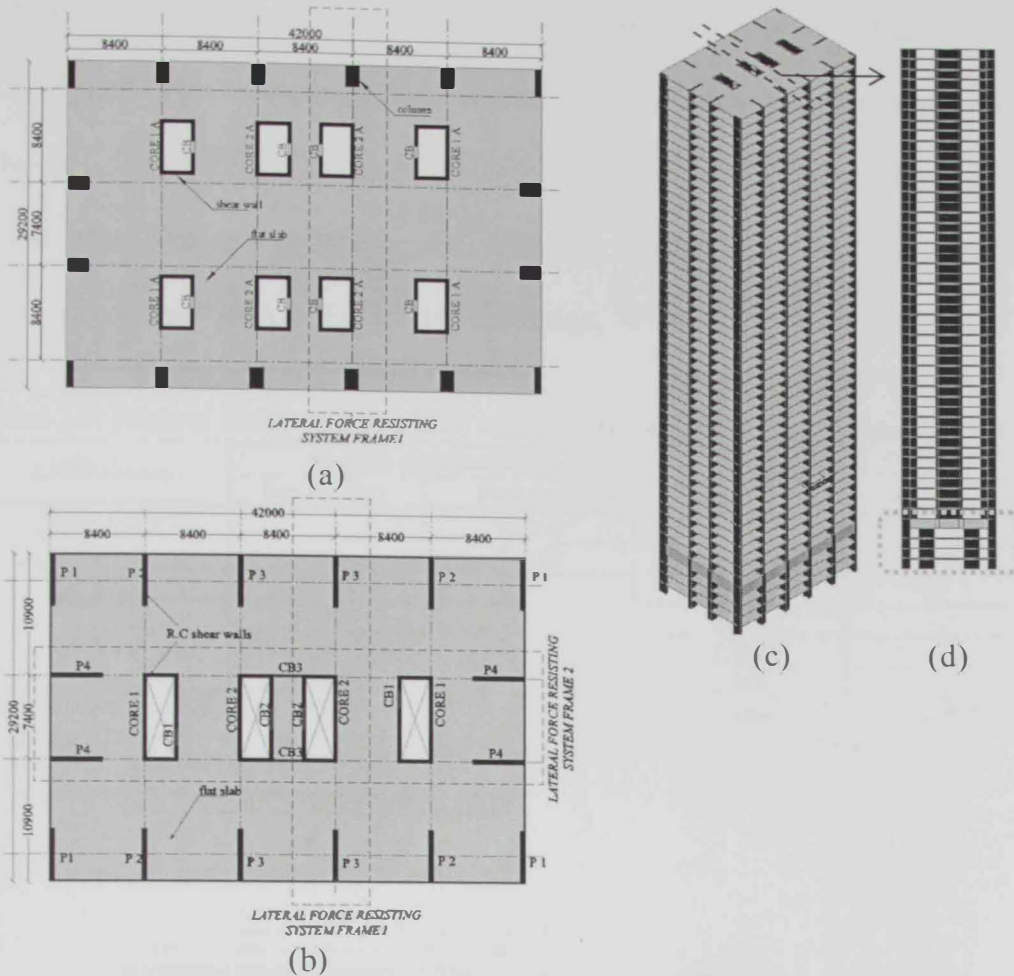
Reference structure B4-DIS, (a) building layout at basement and ground stories, (b) layout at typical stories (c), 3D view and (d) LFRS in transverse direction
